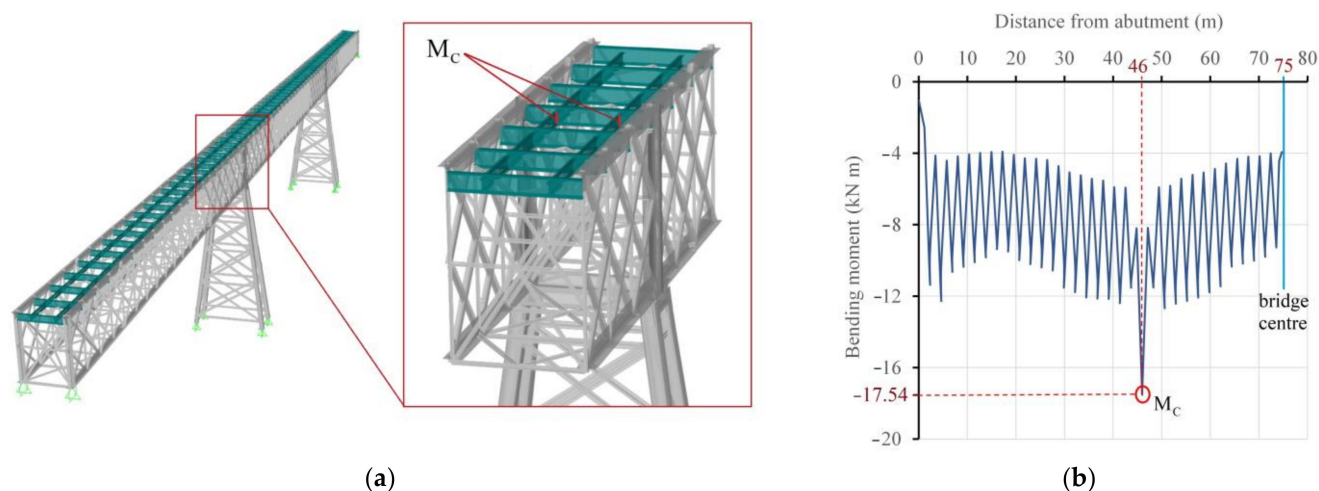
Maximum bending moment M_C at stringer-floor beam connections corresponding with cross-section at intermediate bridge piers (global FE model). (a) Location of connections. (b) Bending moment at connections along the bridge.
